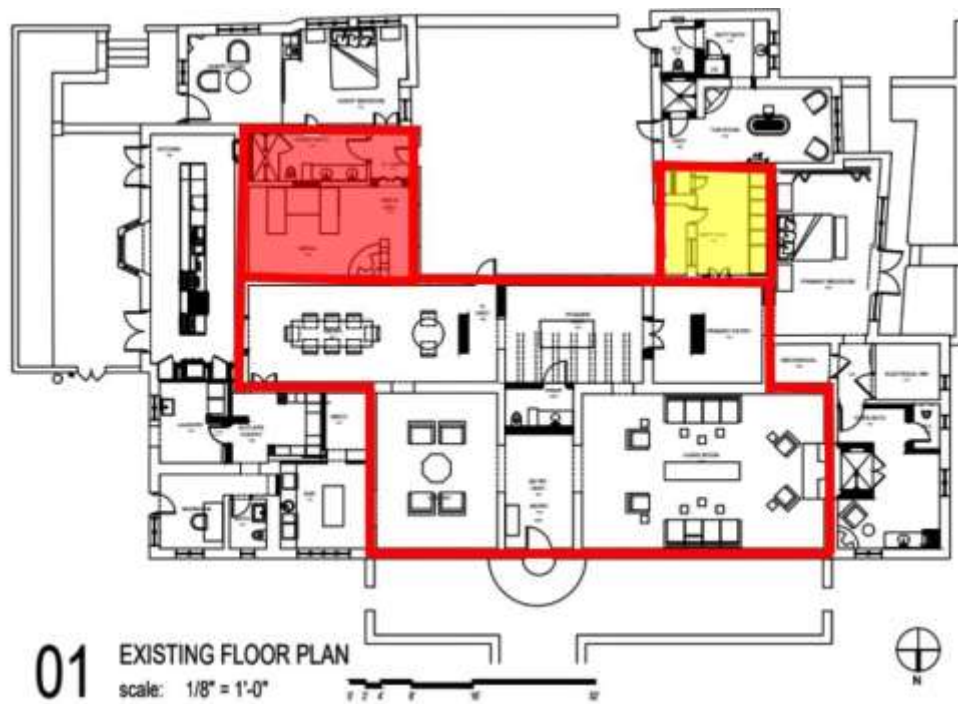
Existing Floor Plan showing the evolution of the structure from 1925 through 1997.
